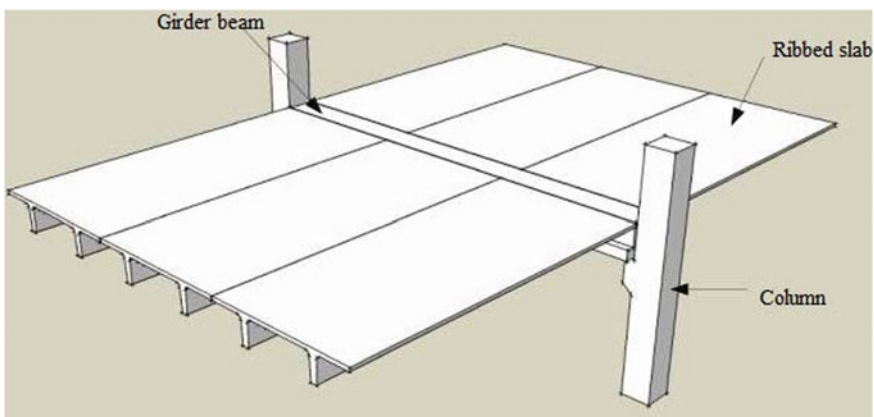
The demonstration of the ribbed slab to girder beam and girder beam to column connection
